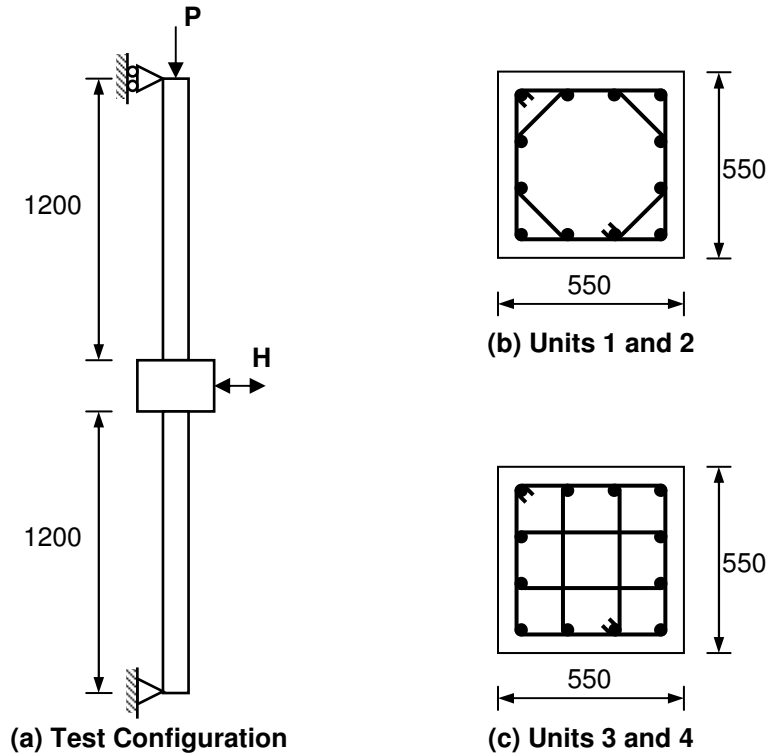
Specimen details for columns tested by Gill et al (1979)
